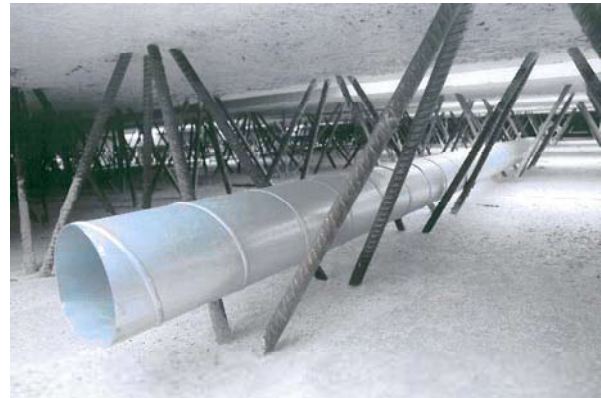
New type of concrete double floor has an extraordinary span of 18 to 20 meters
